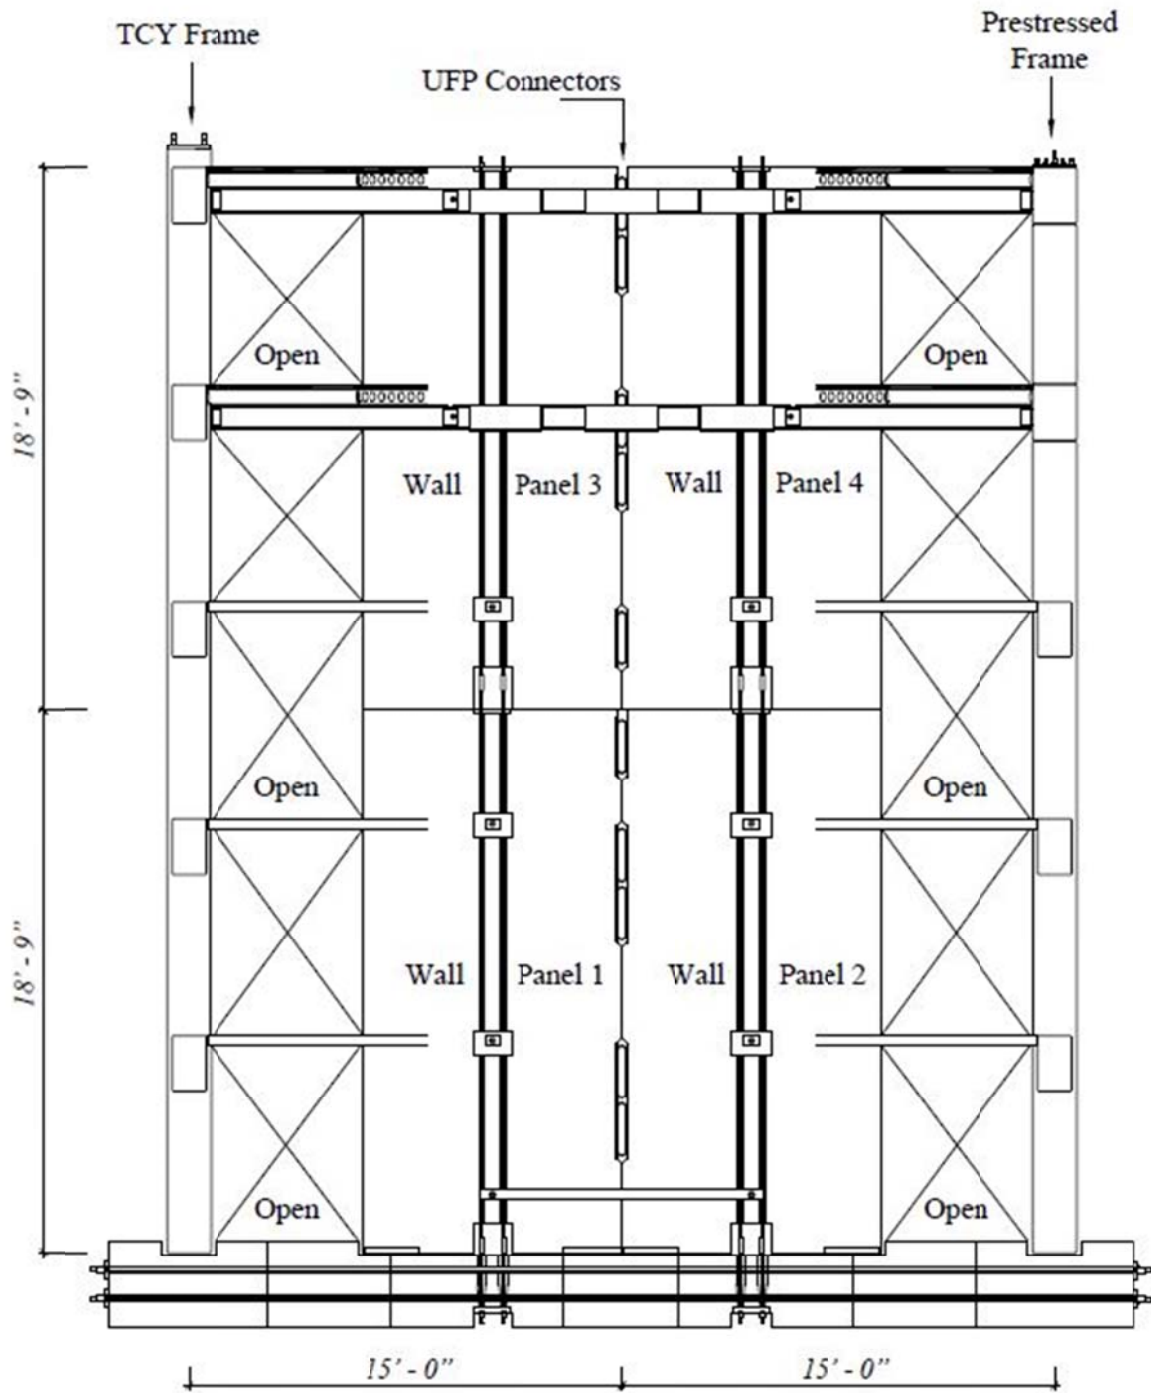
Elevation view of the specimen at PRESSS (Priestley et al. (1999))
